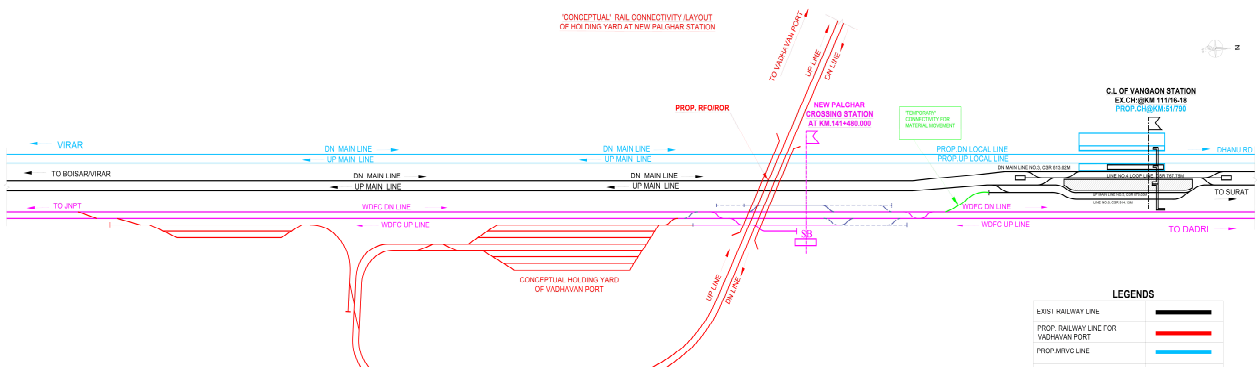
Concept Layout of ROR and New Palghar station arrangement
